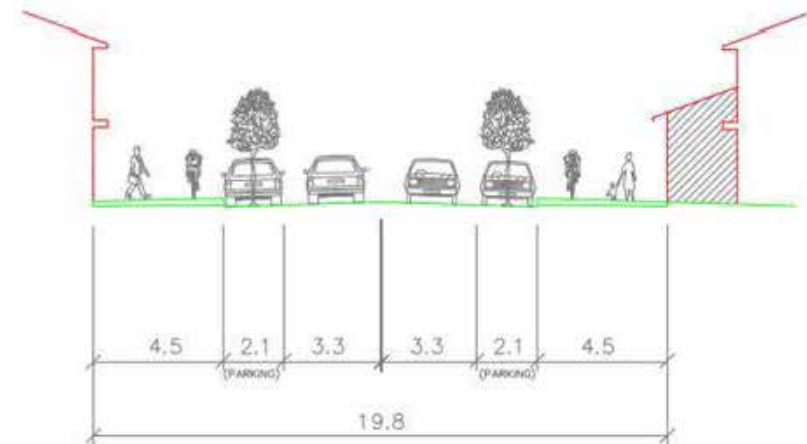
Rudloc Road Proposed Cross-section (Russell Street to Coode Street)
